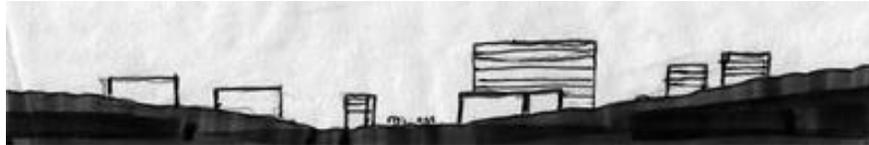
Diagrammatic Site Section, Longitudinal Through Benning Road (South is Left)
